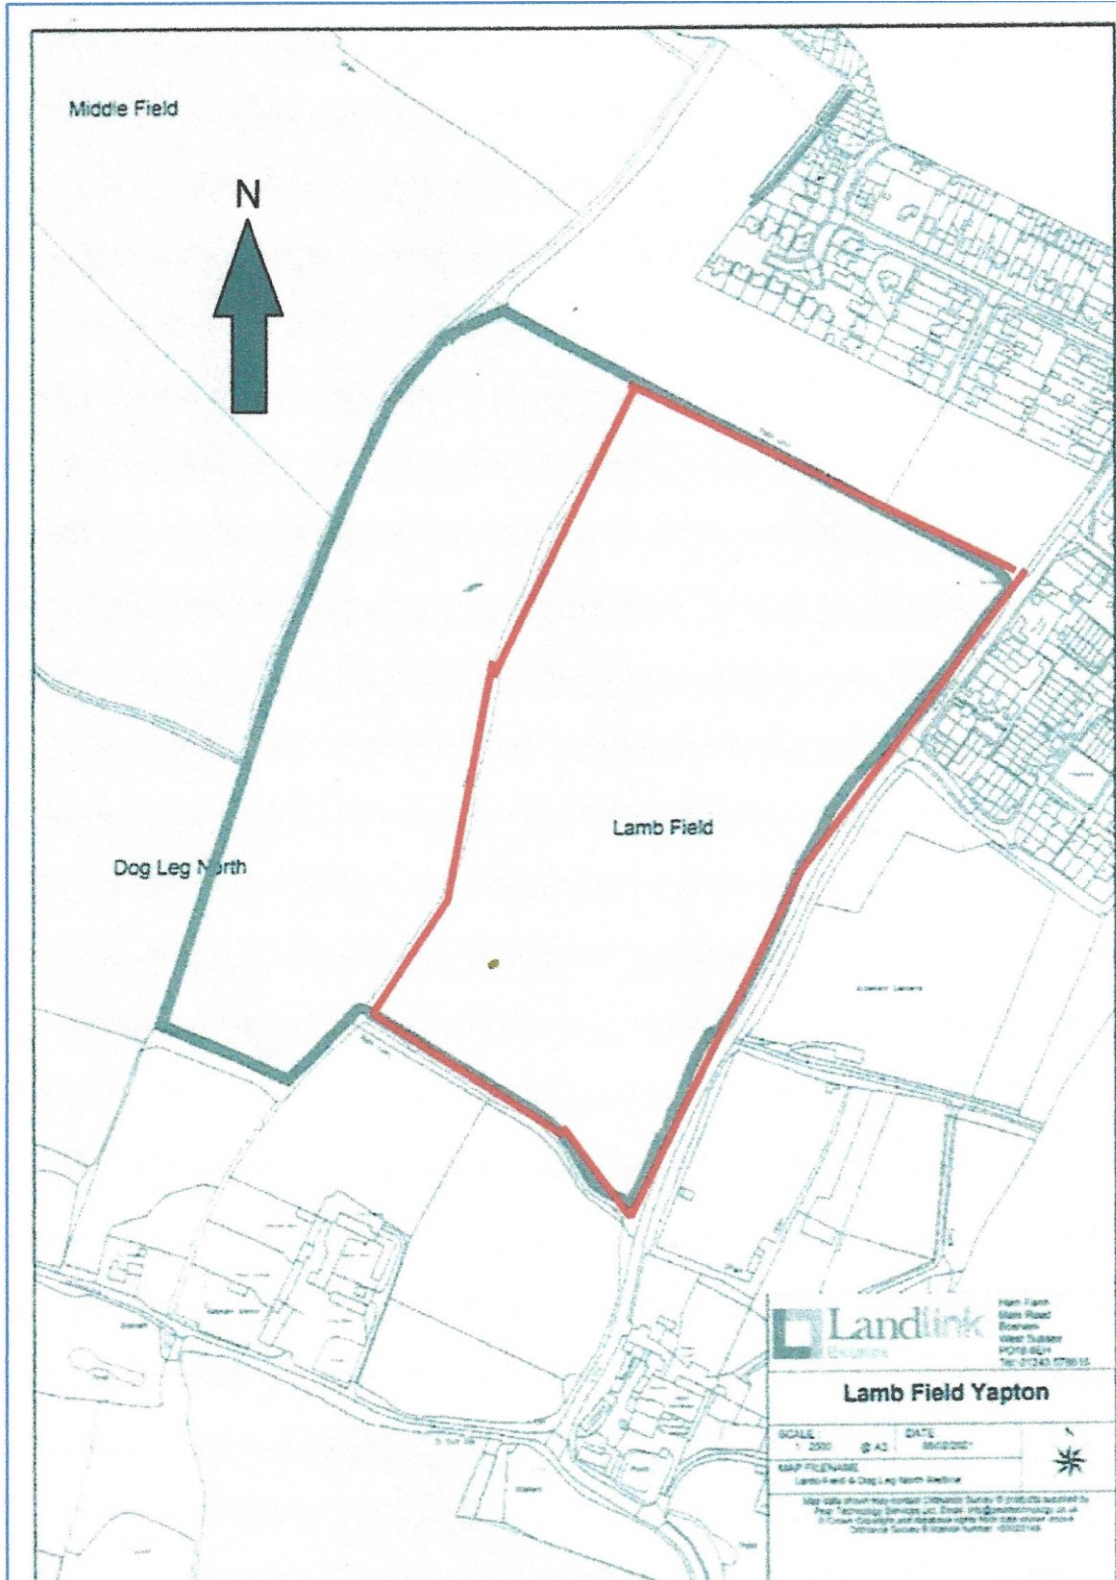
Site location at an original scale of 1:2,500 at A3, (extract from Architects plan). The proposed development site is shown outlined in red.
